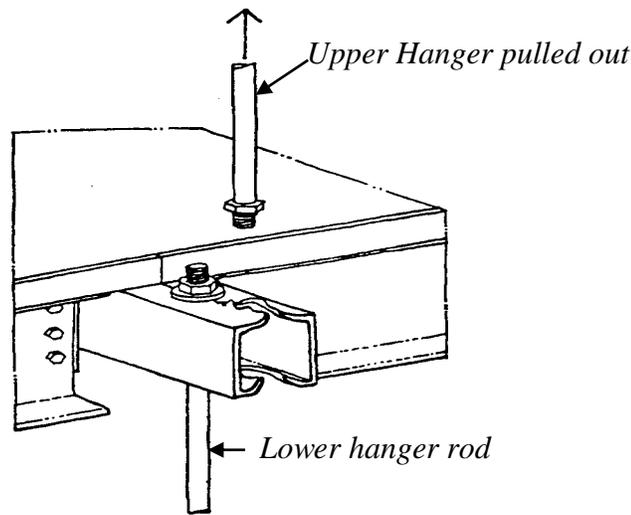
Pulled -Out Rod at Fourth-Floor Box Beam
